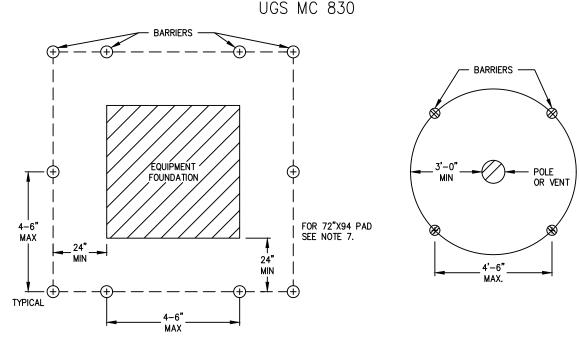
PLAN EQUIPMENT FOUNDATION FIGURE MC 830-1.2: PLAN POLE OR VENT STRUCTURES WILL NORMALLY BE INSTALLED ONLY IN NONTRAFFIC AREAS. PROTECTIVE BARRIERS ARE TO BE USED WHERE CONSTRUCTION
